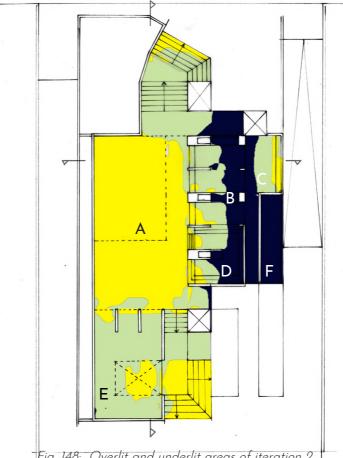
Overlit and underlit areas of iteration 2 adapted from Sefaira (Author 2021)
